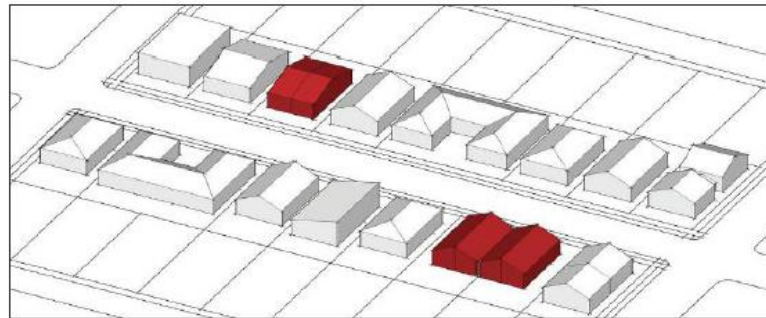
Integrated Infill Buildings with the Existing Structures (Aliyu, 2018).
